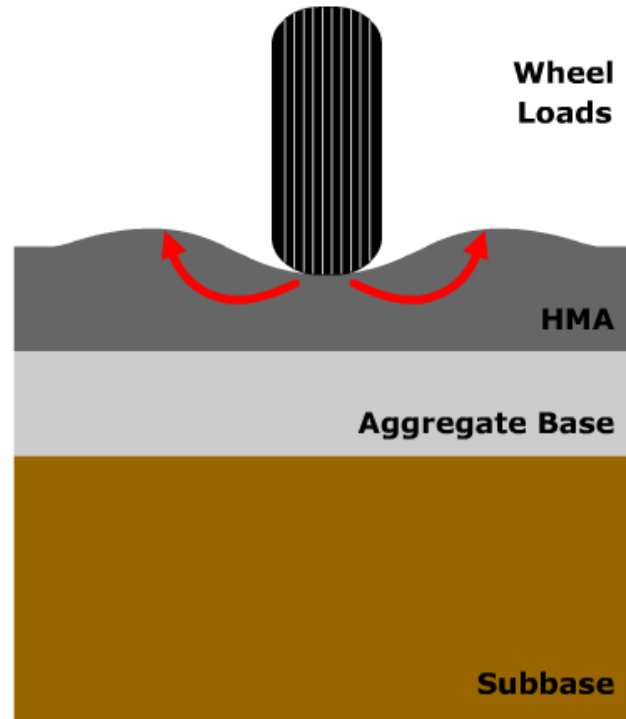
Shear Deformation Rutting Schematic (Pavement Interactive, 2018)
